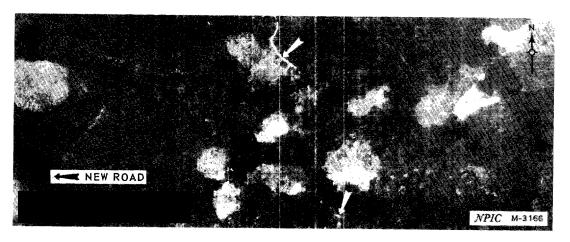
NEW ROAD BETWEEN ROUTES 91 AND 9, LAOS PANHANDLE
